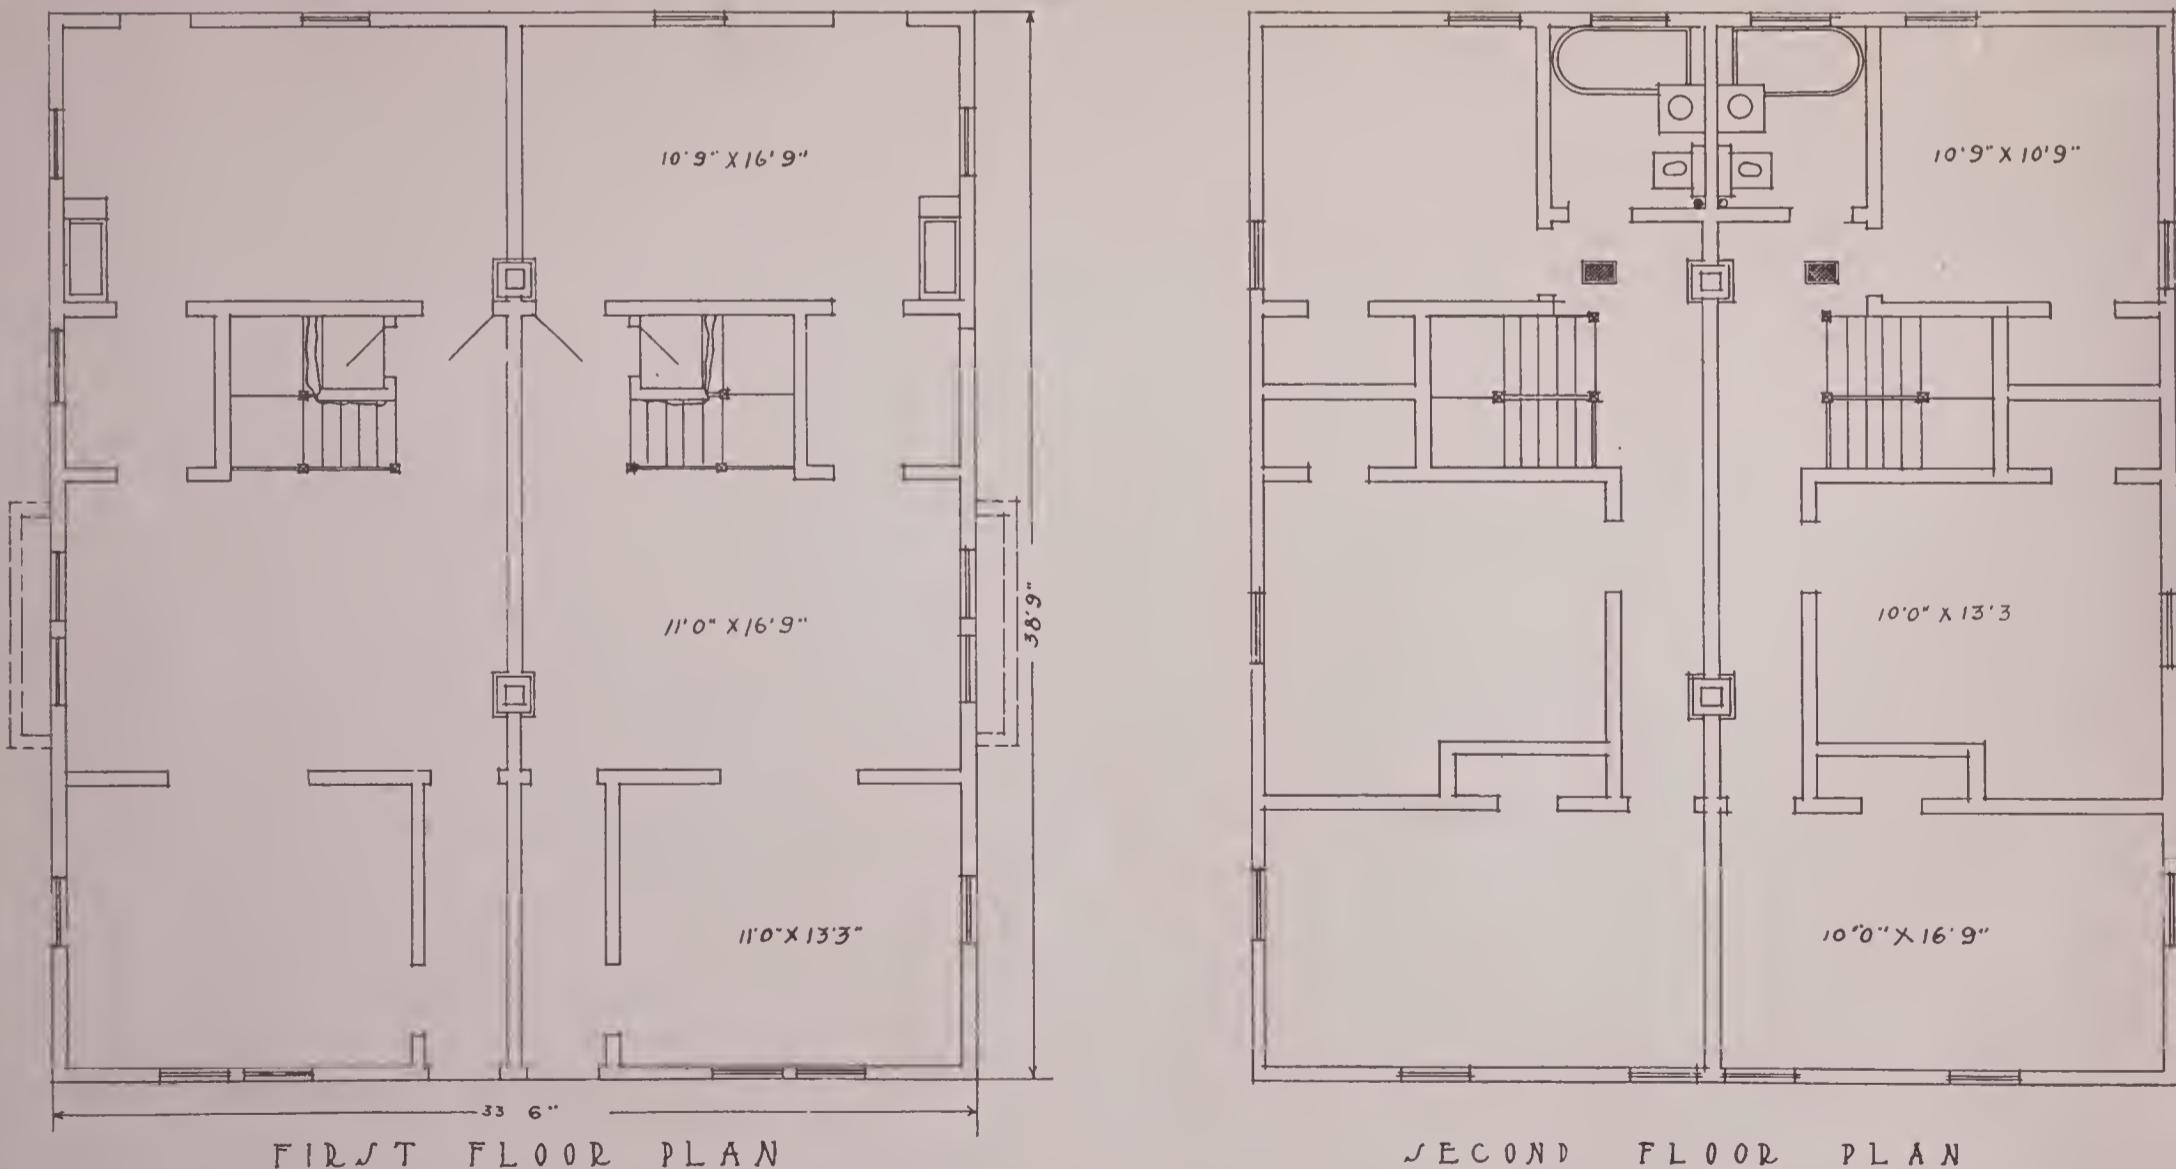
PLATE XIIIa.—Floor plans of Longmeadow Cottage. An eight room twin house erected by the Ludlow Manufacturing Associates at Ludlow, Mass. Cost, \$3,400.00.
